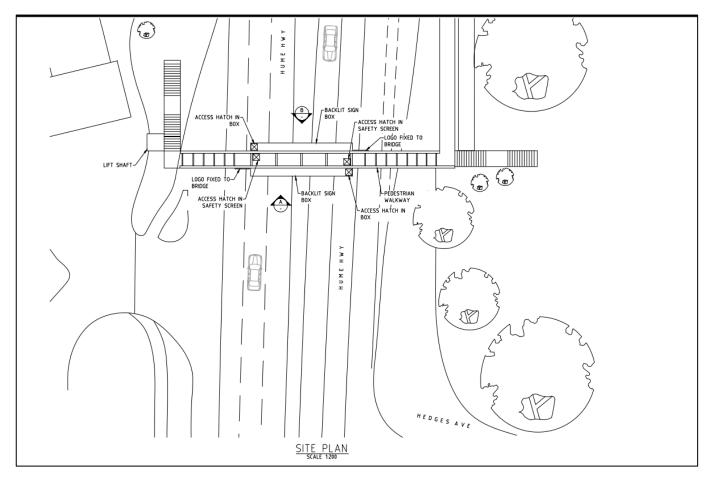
| Site plan (Source: Revised architectural drawings 23/10/24)
